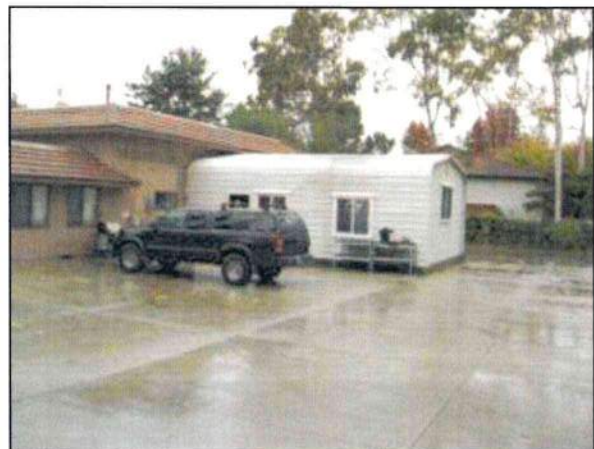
Fire Station #4 A general view of the rear of the building showing the later addition.
